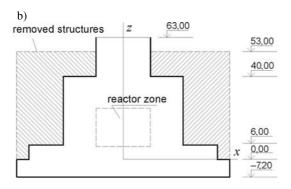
Schematic illustration of the building: a – layout of the building; b – outline of the monolithic and removed prefabricated structures
